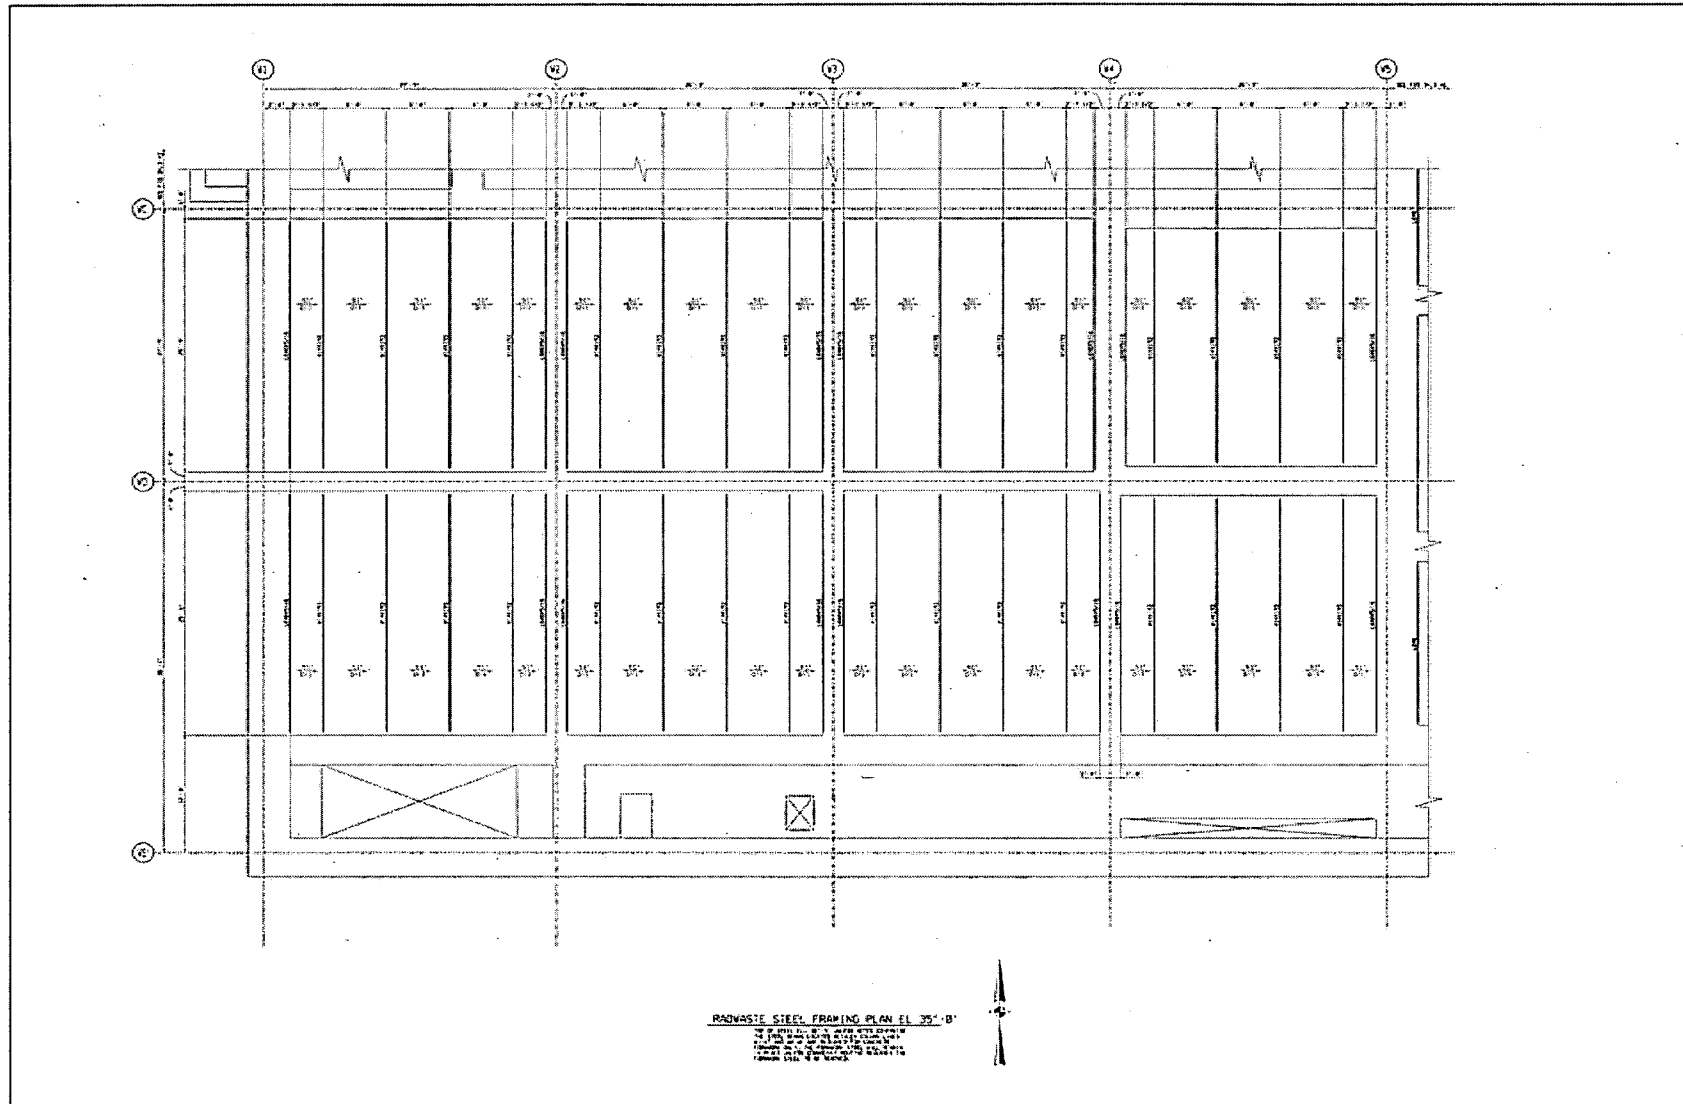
H.3-42: ELEVATION 95 LOOKING DOWN
